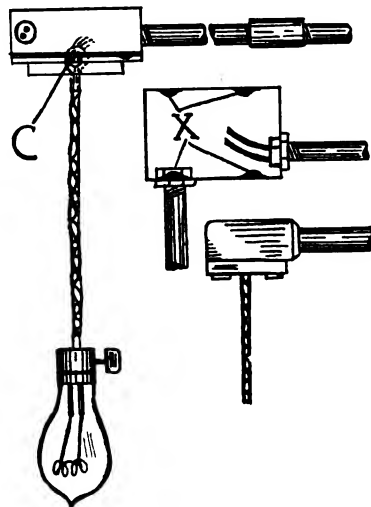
SHOWING PLAN OF CONDUITS AND ALL DETAILS OF WIRING
